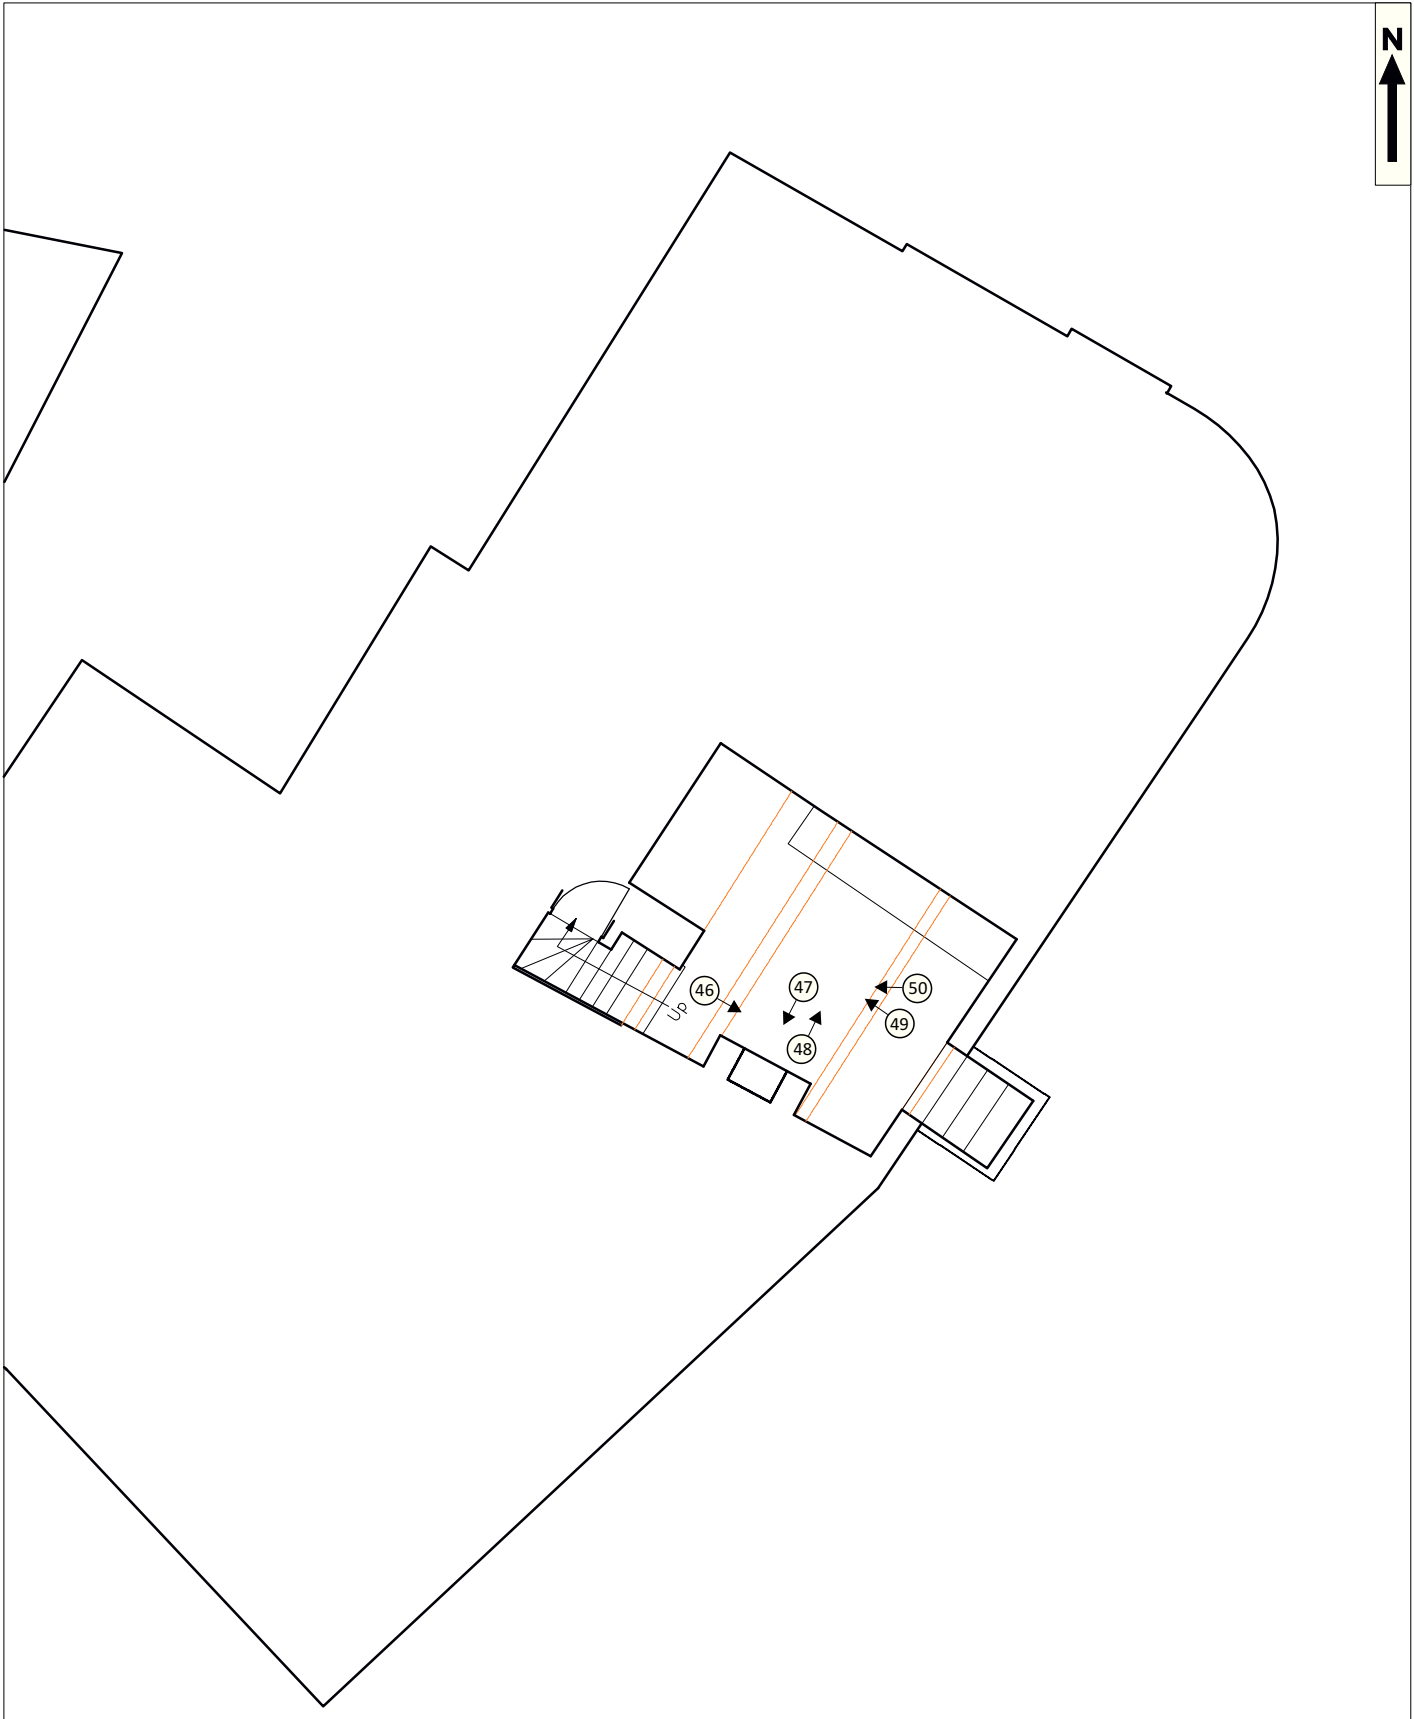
Ground floor plan showing location of photographs (Background plan provided by the client)
